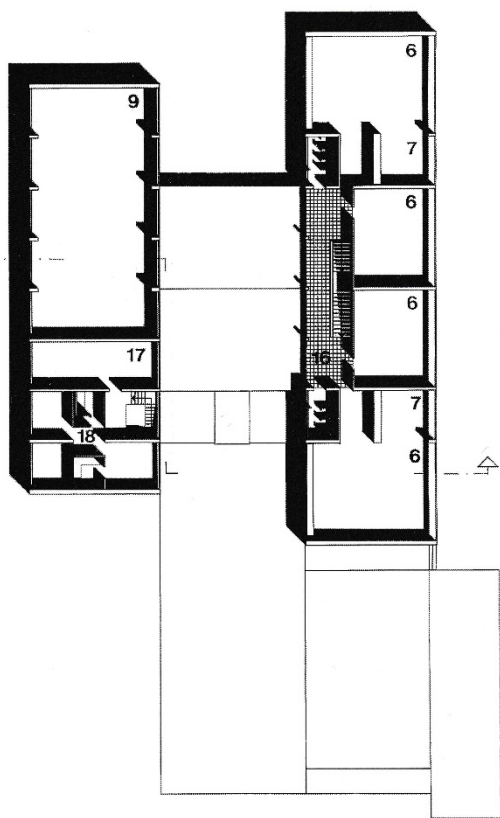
Floor plan primary school in Hallstatt, with two classroom units and two regular classrooms on the upper floor. Source: Hufnagl archive.
